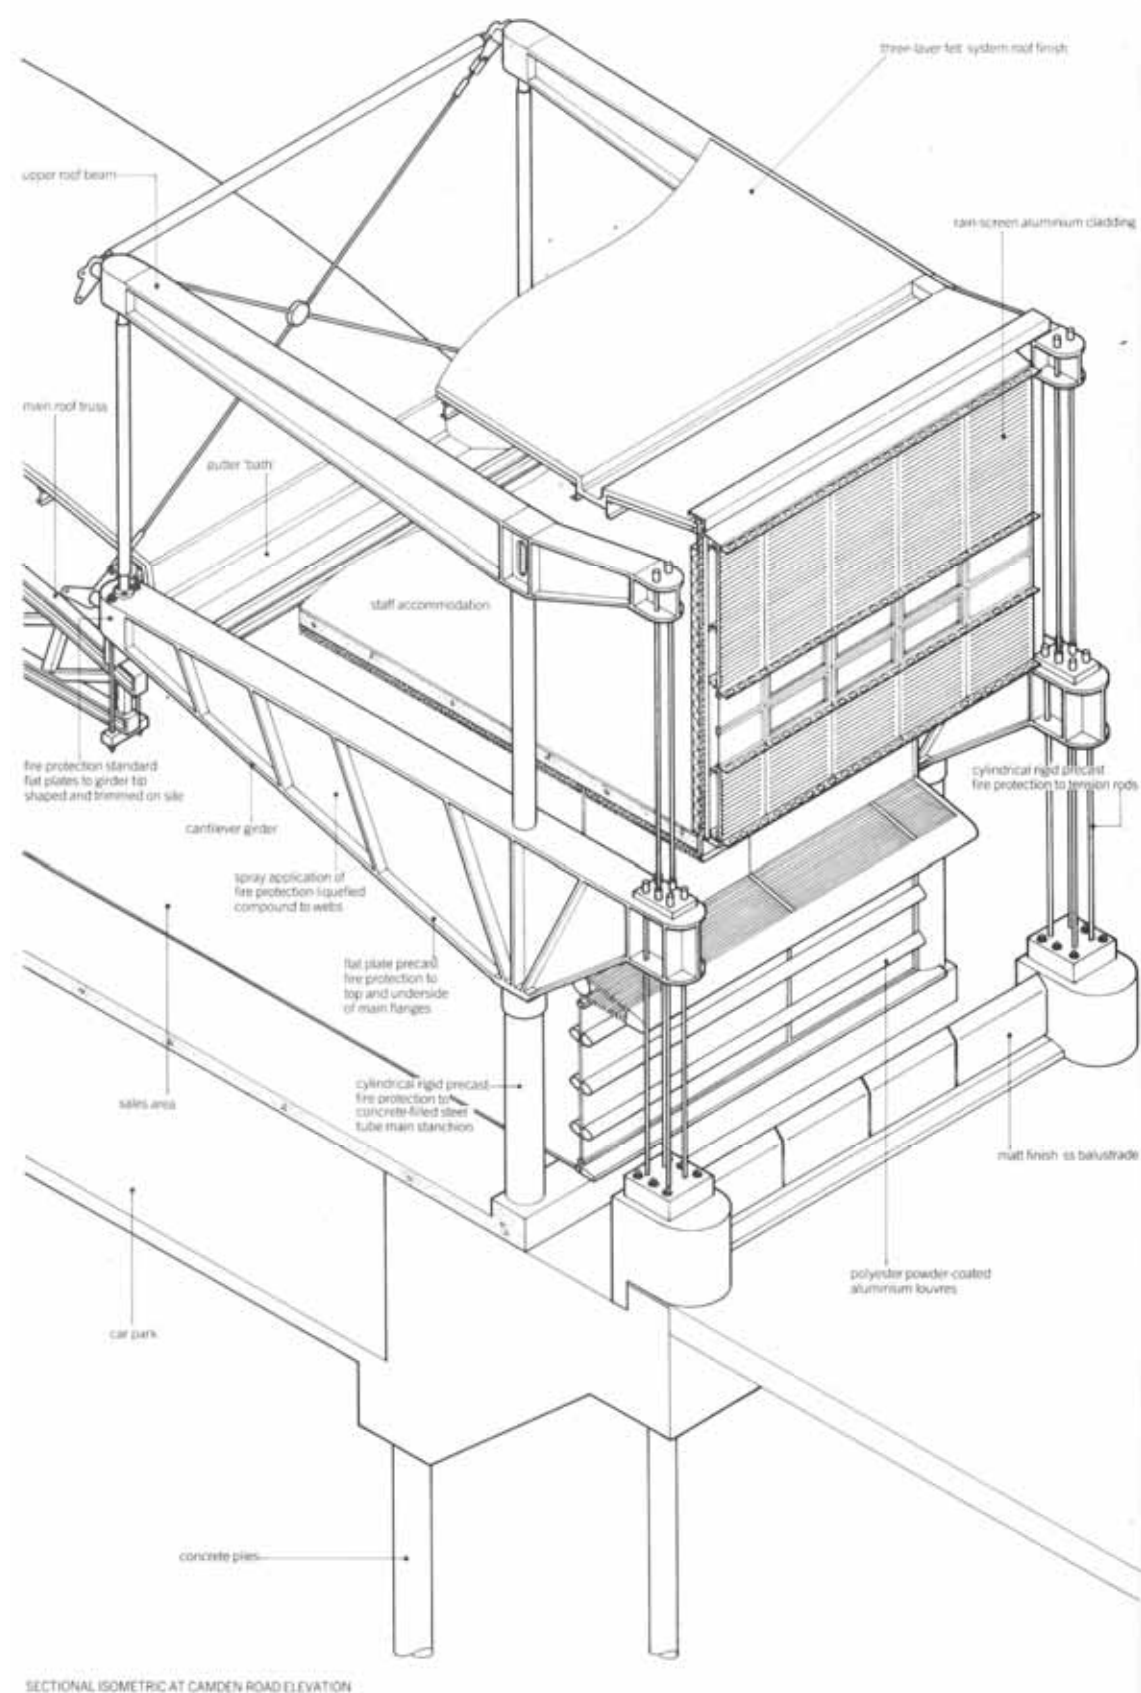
1988: Isometric elevation of the Camden Road elevation
